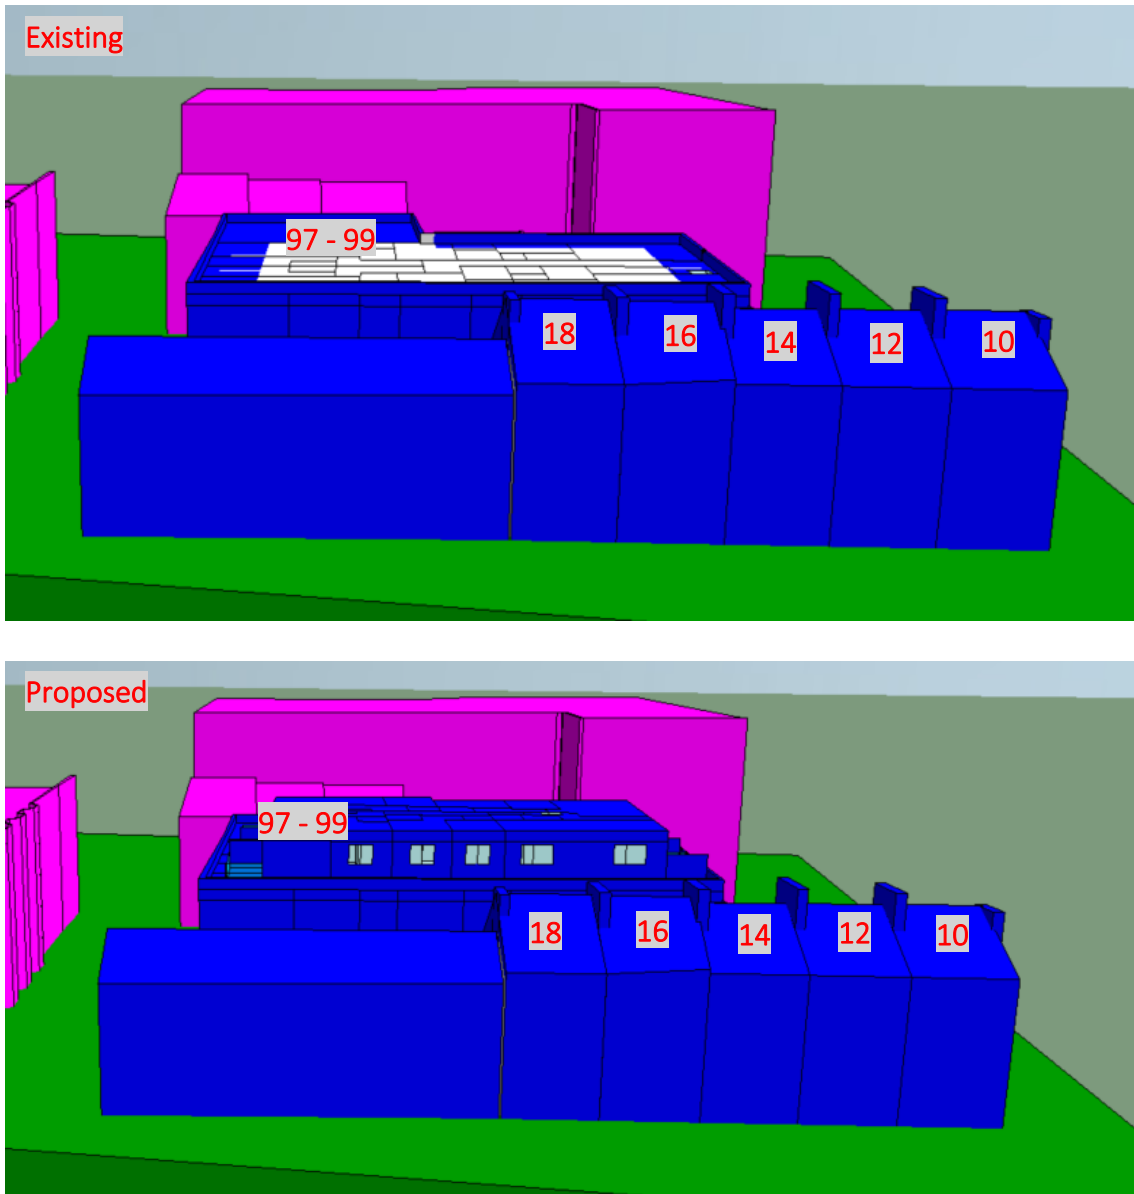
Existing & proposed development with adjacent properties – view from west
